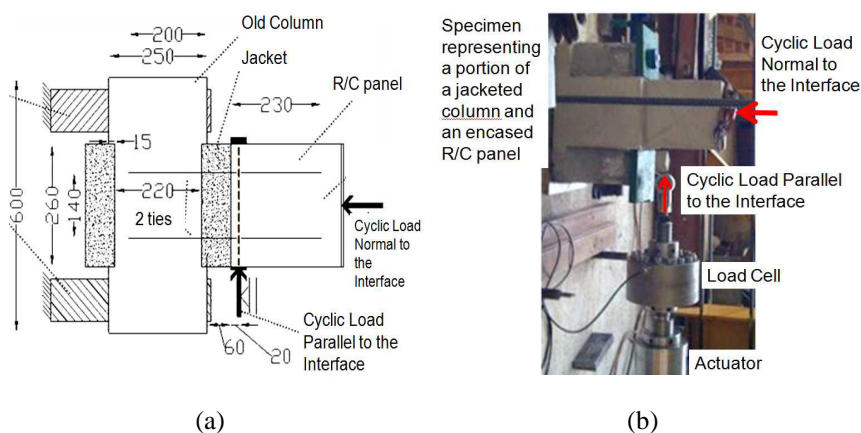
(a) Loading arrangement of a portion of encased R/C panel and the jacketed column. (b) Loading arrangement of a portion of encased R/C panel and the jacketed column.
